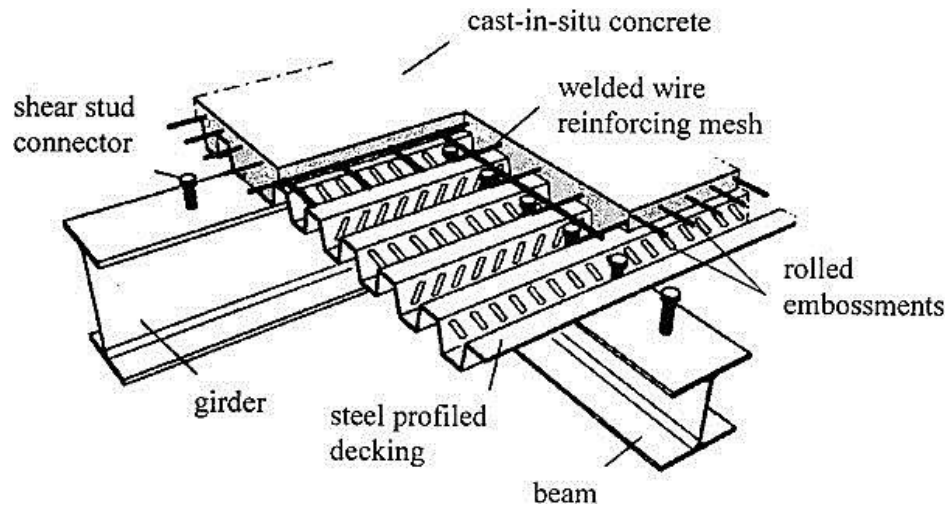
Typical steel and concrete composite constructions (adopted from Crisinel and Marimon, 2004)
